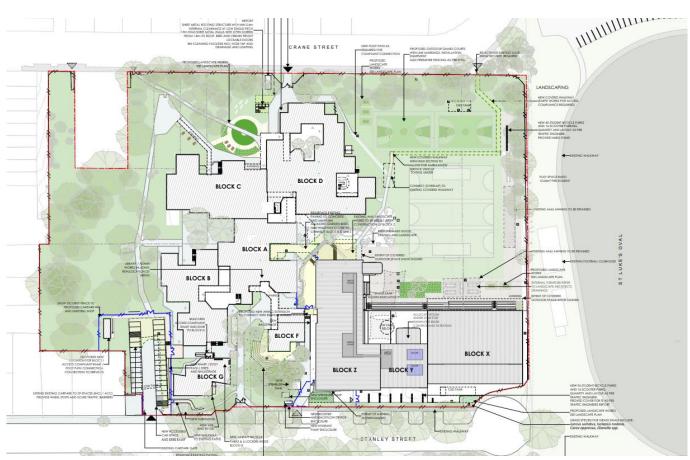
Extract from Site Plan (Source: JDH Architects, 2023)
